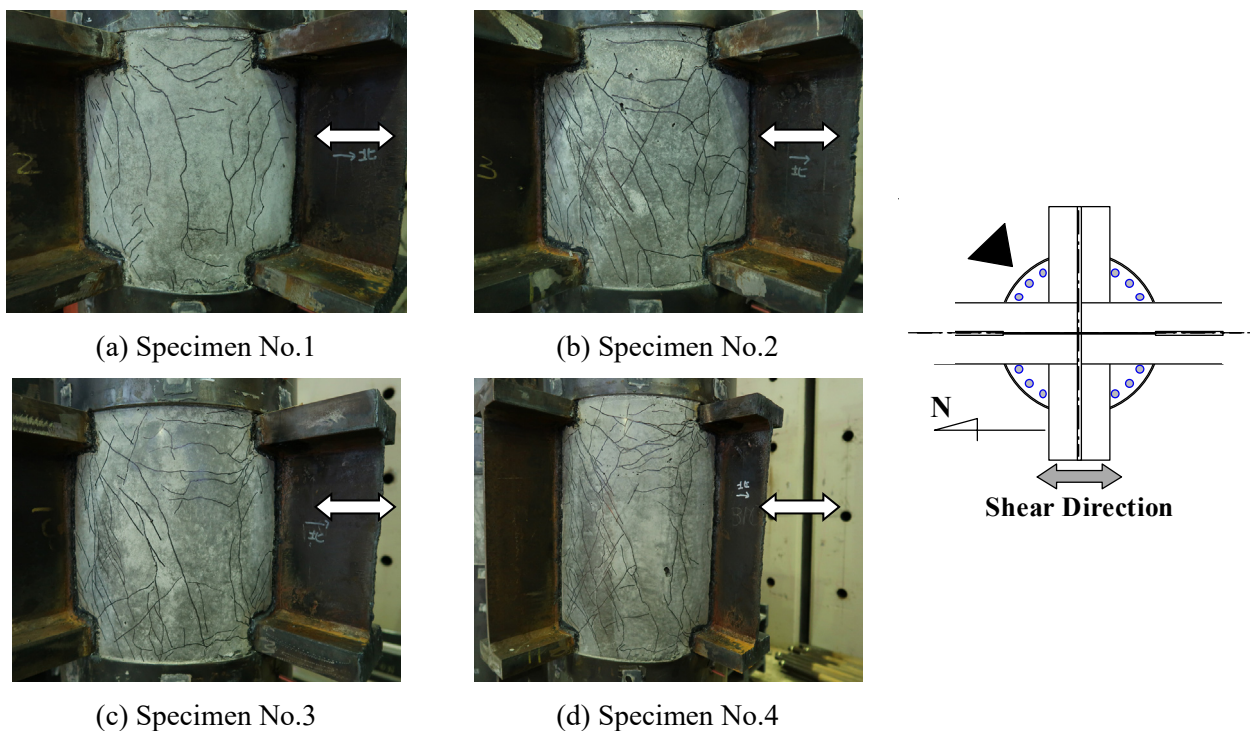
Cracking patterns of joint concrete after loading (North-East side)
